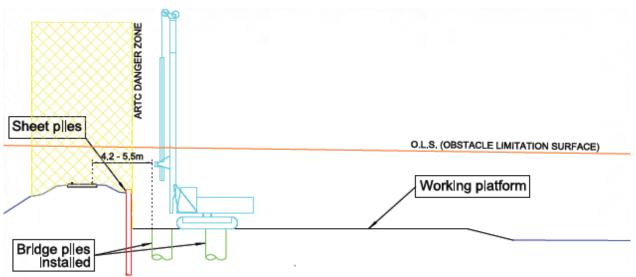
Tallest construction equipment (piling rig at Wentworth Avenue extension)
